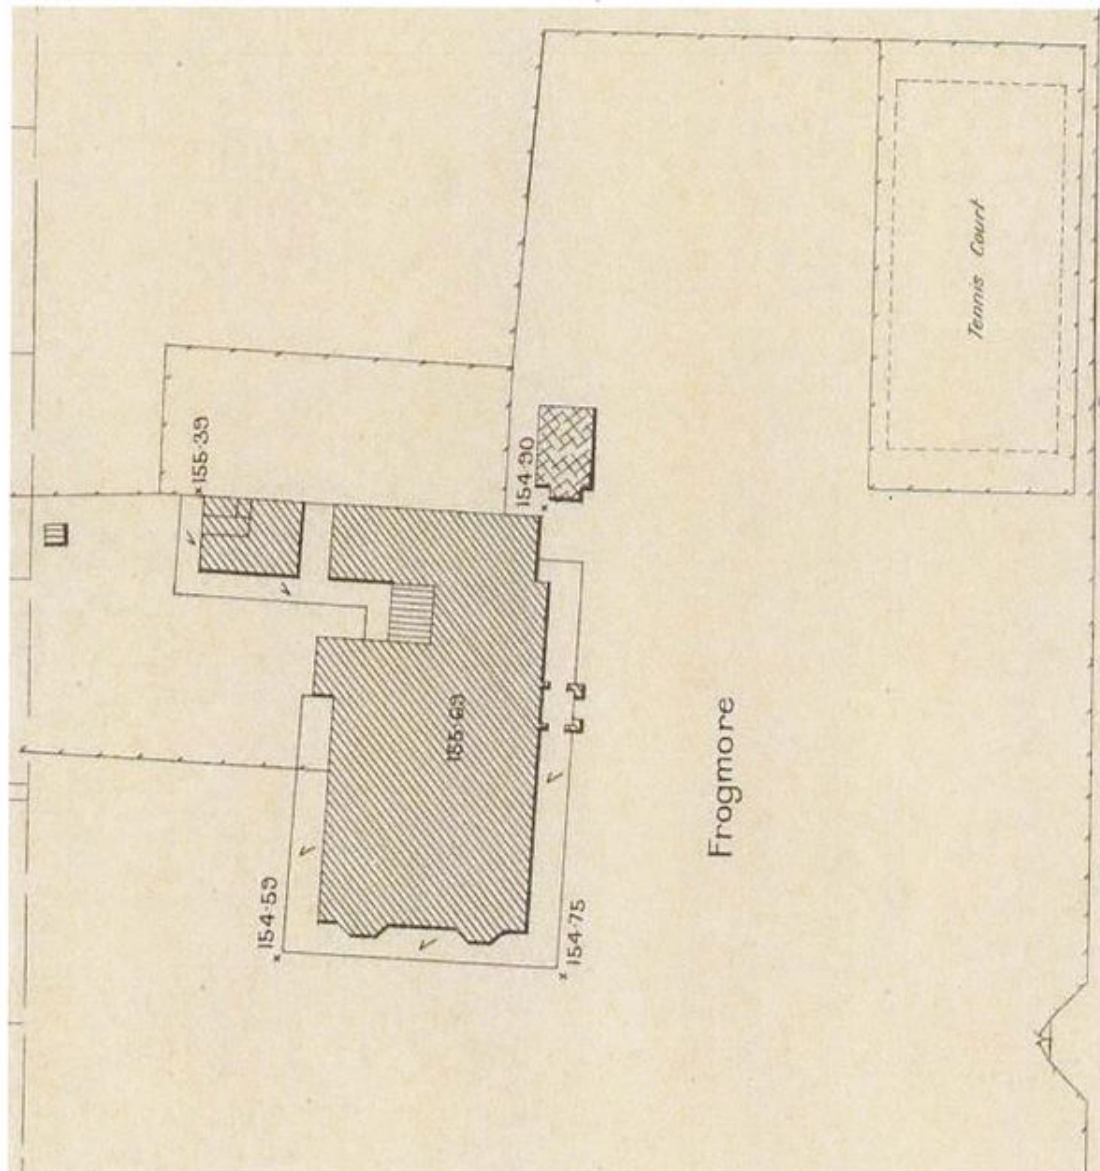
Frogmore: MMBW Detail Plan 2853, 1919, part, showing masonry towered villa with masonry north service wing, verandahs and drive entry from Wahgoo Road, all as existing (marked by tiled roof in Figure 1), timber shade house to north-east corner, and tennis court since removed.
